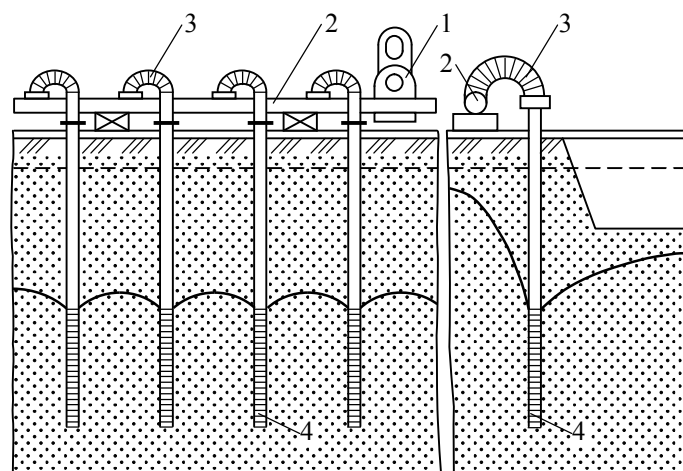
Scheme of a mud-filter unit: 1 – pump unit; 2 – collector pipe; 3 – hose; 4 – head filter
